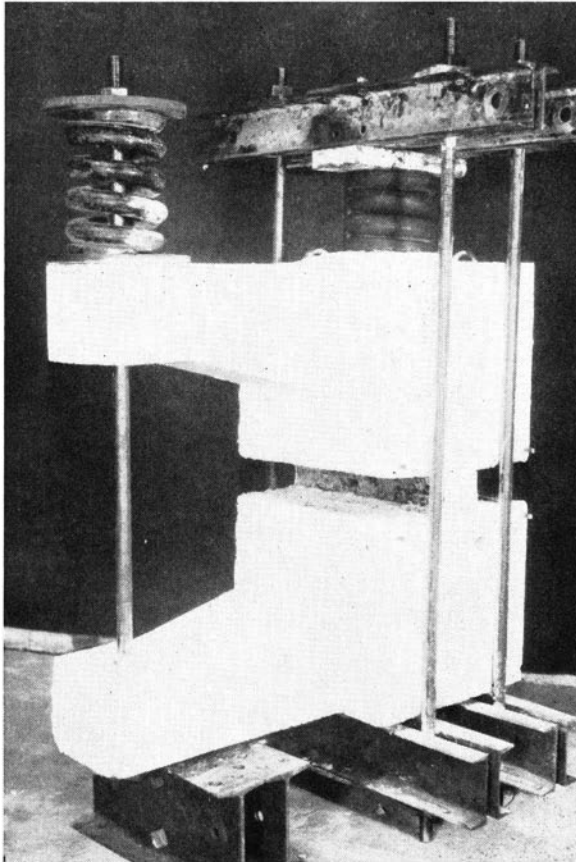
ROTATION SPECIMEN EQUIPPED FOR TESTING
